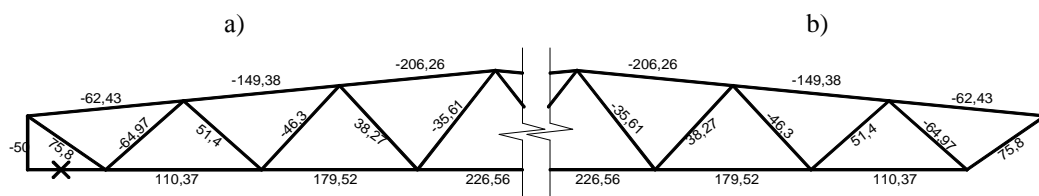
Forces of the poles of the trusses: a) forces of the lower bearing type trusses; b) forces of the upper bearing type trusses
